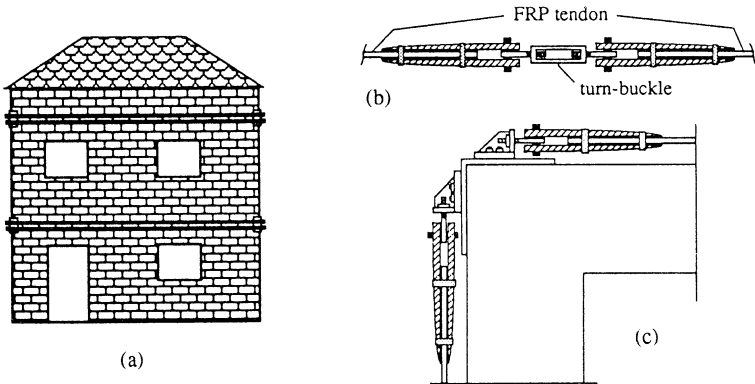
(a) Application of external FRP ties; (b) anchorage for circumferential prestressing of semi-spherical domes; and (c) anchorage/attachment for masonry structure corners.
